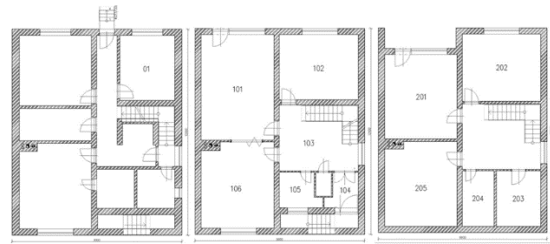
Simplified construction drawing indicating the rooms to be heated; 1st floor, 1st floor and 2nd floor
